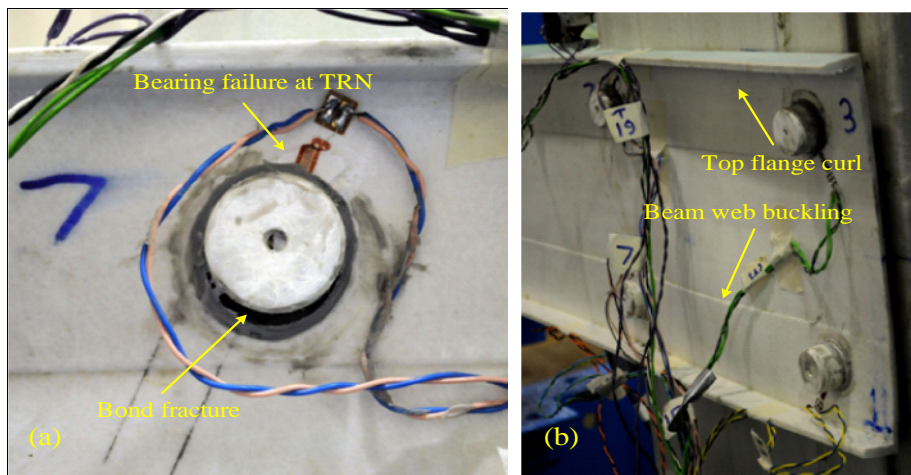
SPJ-2 failure mode: (a) bearing failure; (b) beam web local buckling.
